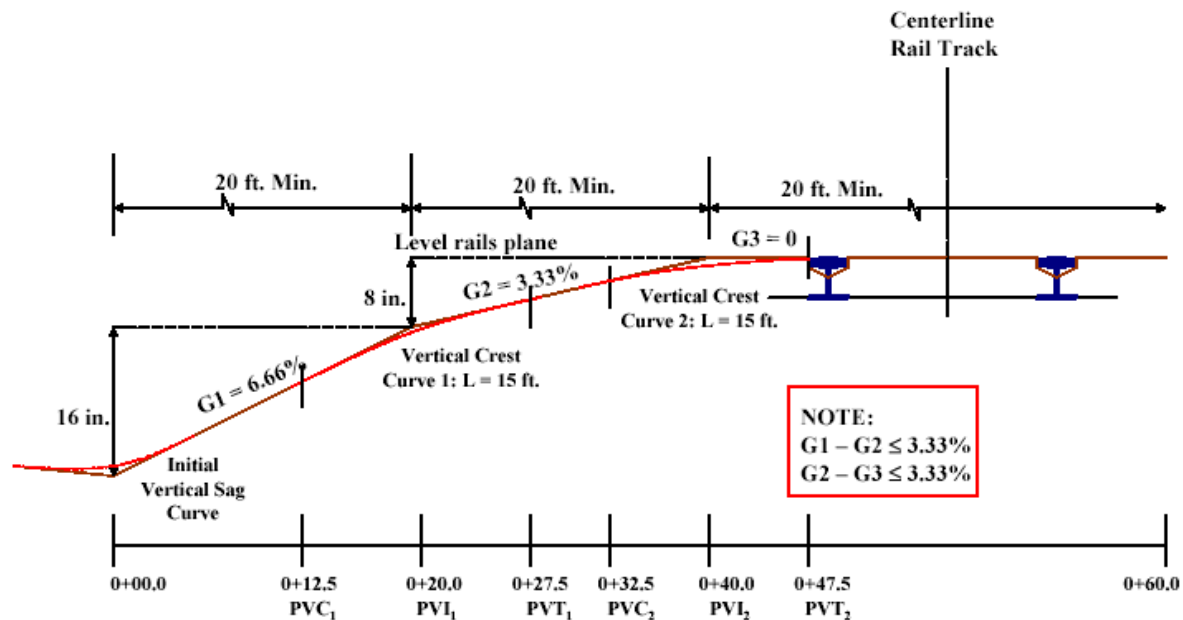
Fitting Three Vertical Curves To An Approach To A Railroad Crossing Profile
